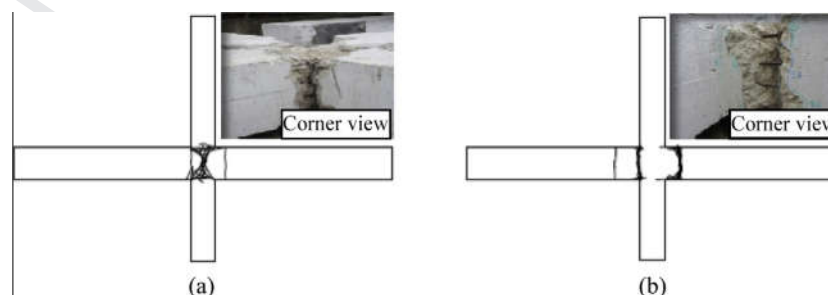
The extent of damages before retrofitting (a) JPA3 and (b) JPB.
